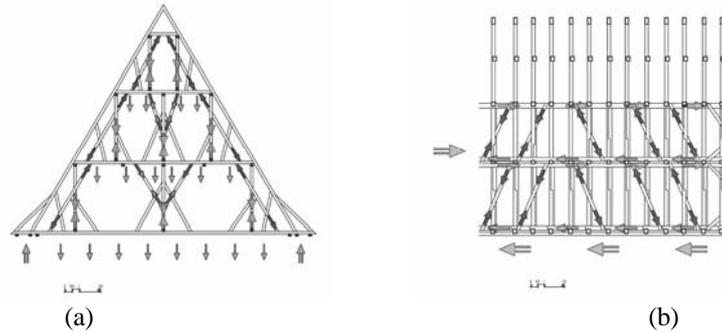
Gothic roof structure on common rafters and tie-beams with collar beams, (a) Main transverse frame (b) Longitudinal frame
